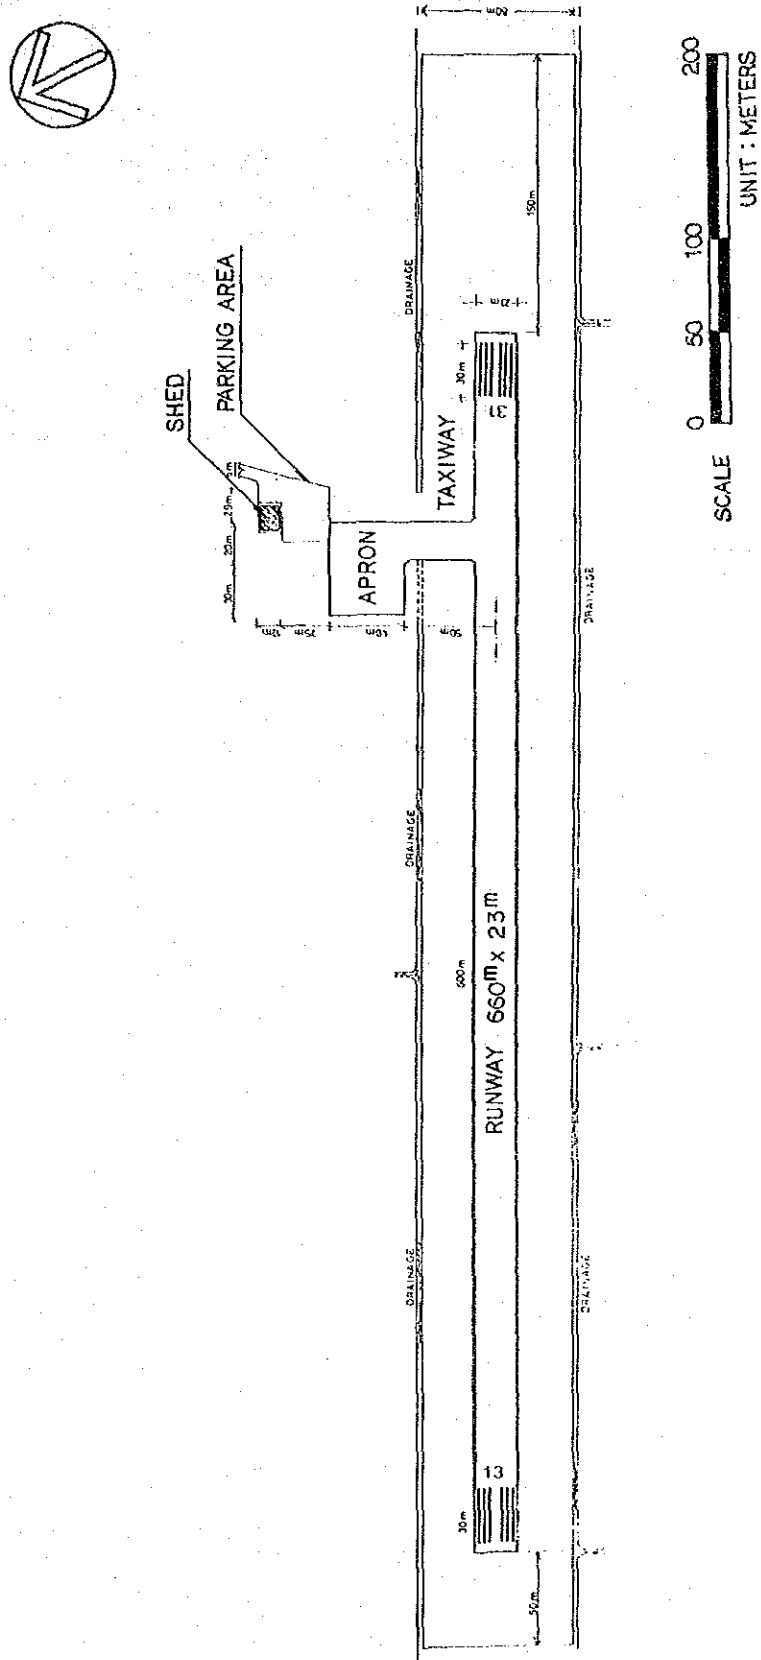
Existing Layout of Cilacap Airstrip
